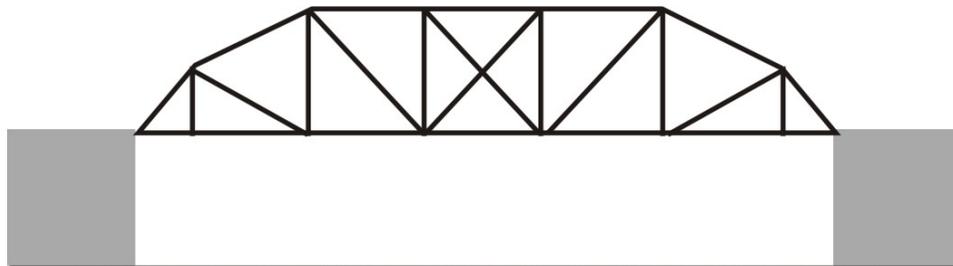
Enterprise Bridge (1924-25), spanning Smoky Hill River on K-43 Highway, Enterprise, Dickinson County, Kansas. This structure is an example of a Parker truss.
